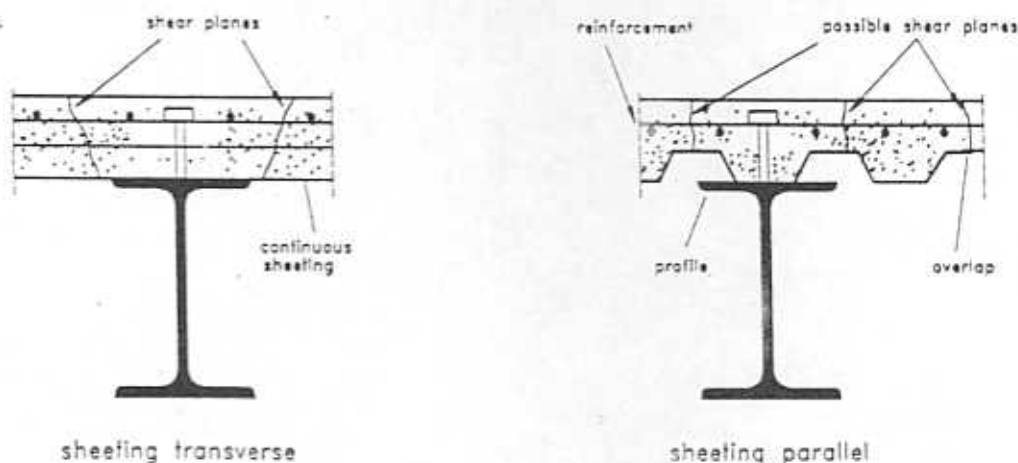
Potential Shear Surfaces in a Slab with Profiled Steel Sheeting
